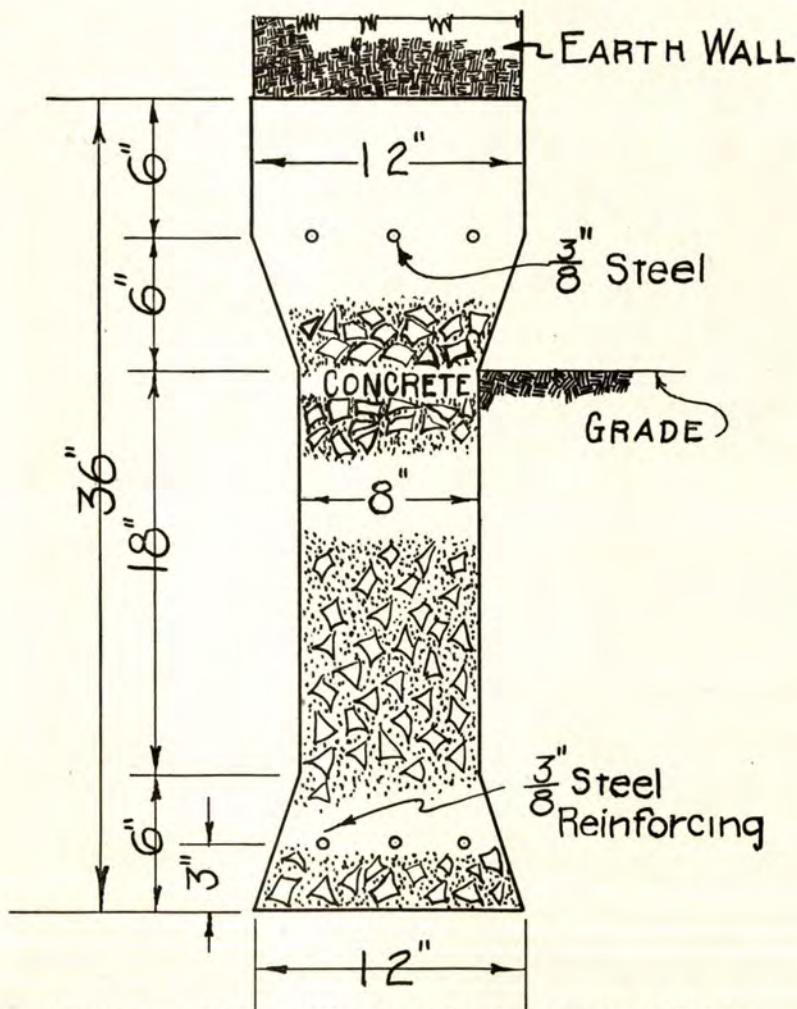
A TYPE OF CONCRETE FOUNDATION BEING TRIED OUT UNDER LIGHT PISE WALLS.
